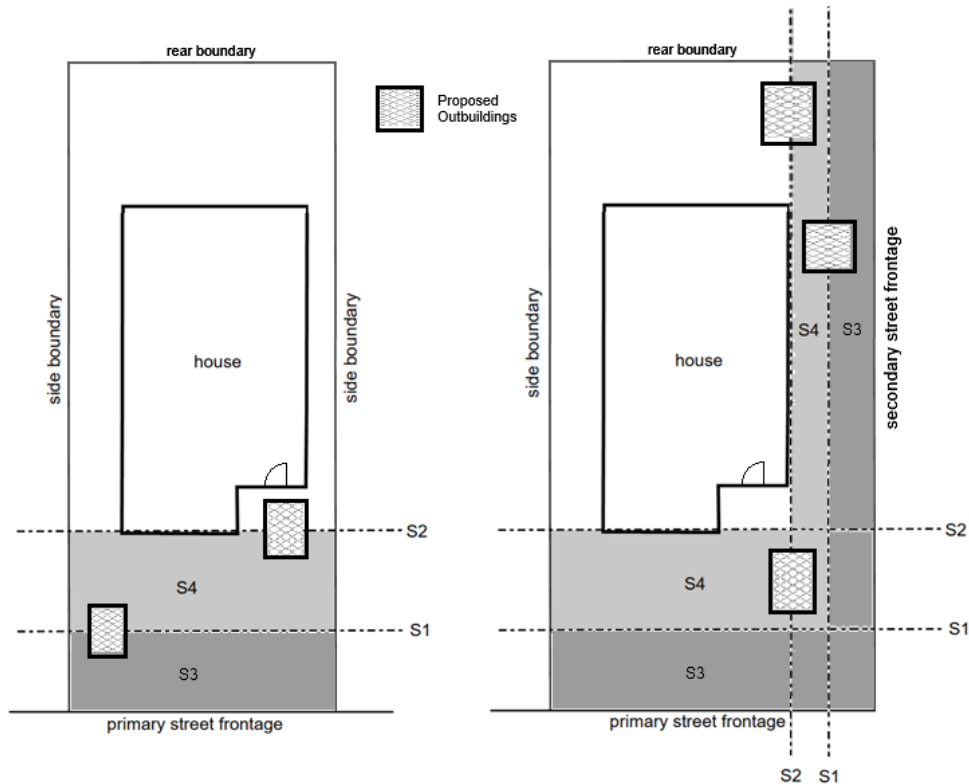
Outbuilding modifications in this local planning policy would not apply to these outbuildings.
